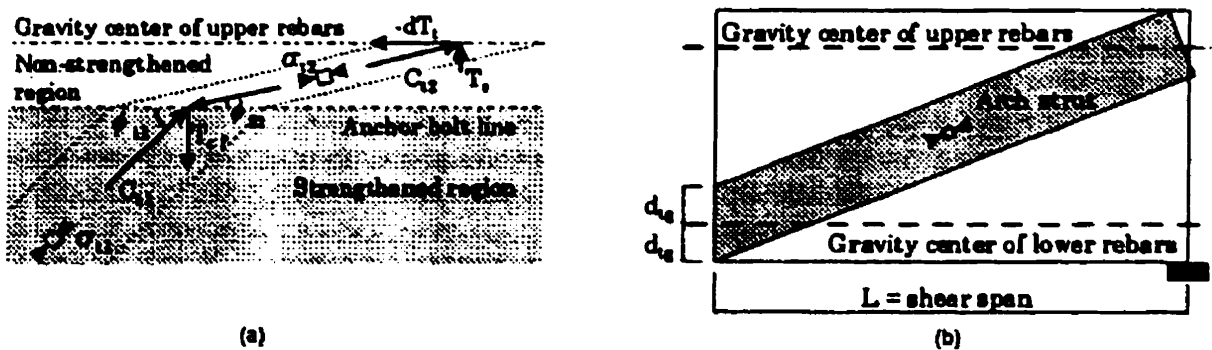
Stress field for Type 3 anchorage system: (a) truss and (b) arch actions [37]
